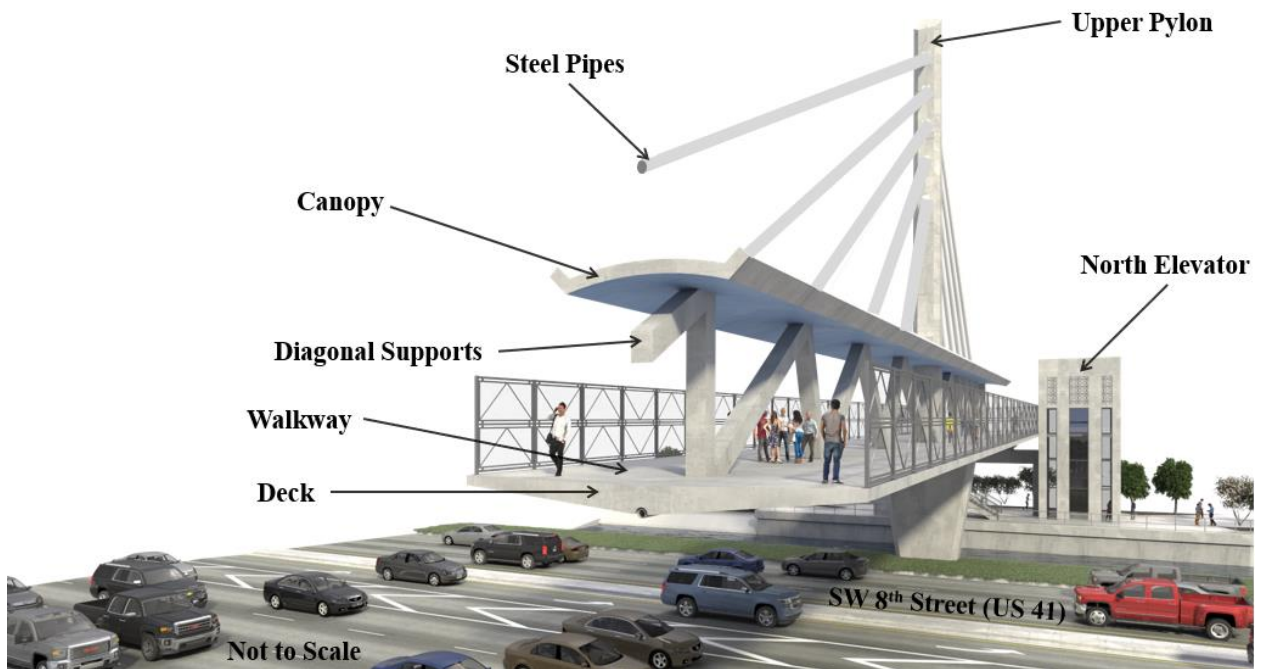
Rendering of what the cross section of the pedestrian bridge deck would look like when completed looking to the northwest (Source: FIU modified)
